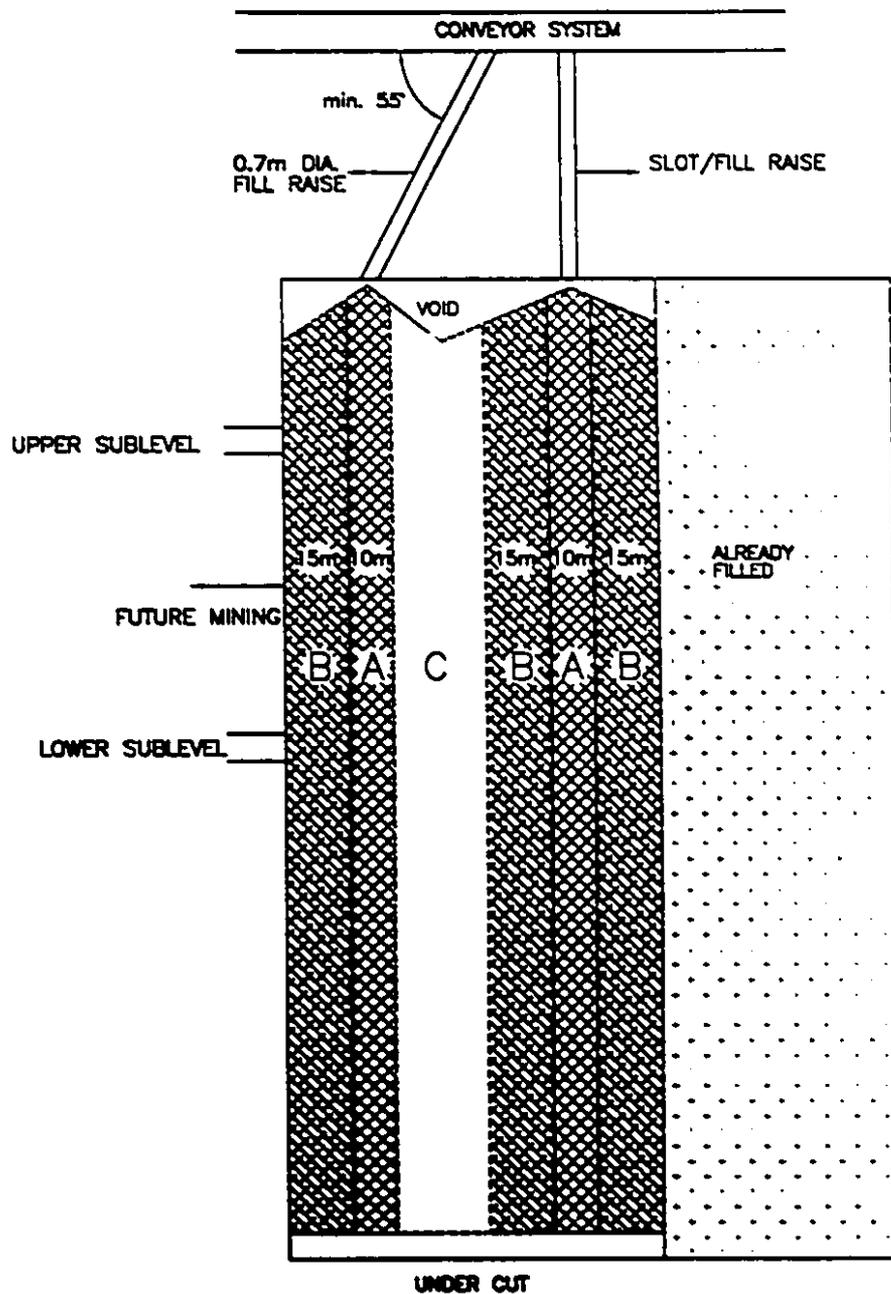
Typical Multi-Raise Set-Up At KCM Using Existing Slot/Fill Raise
